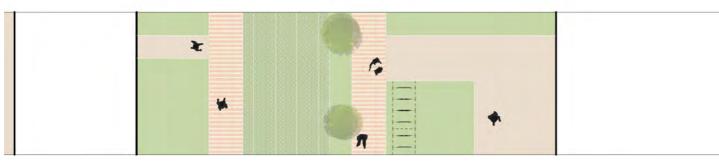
Illustrative section and plan for the Diagonal Route
